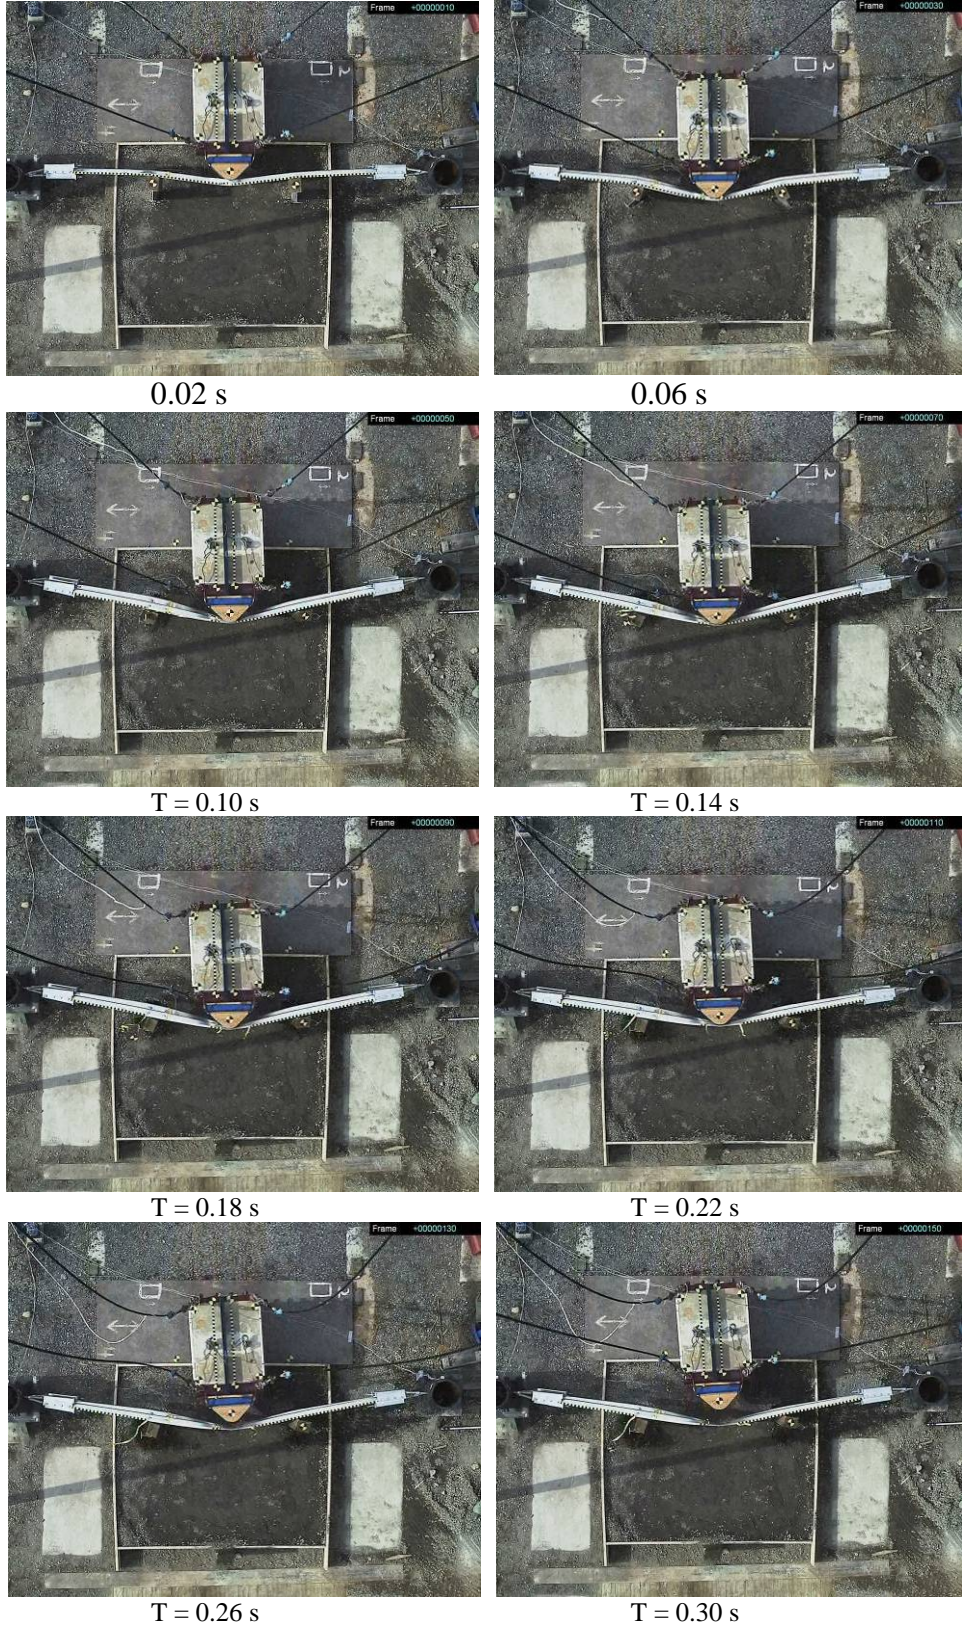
Sequential Photographs for Undamaged Section (Test 01-2): Overhead View
